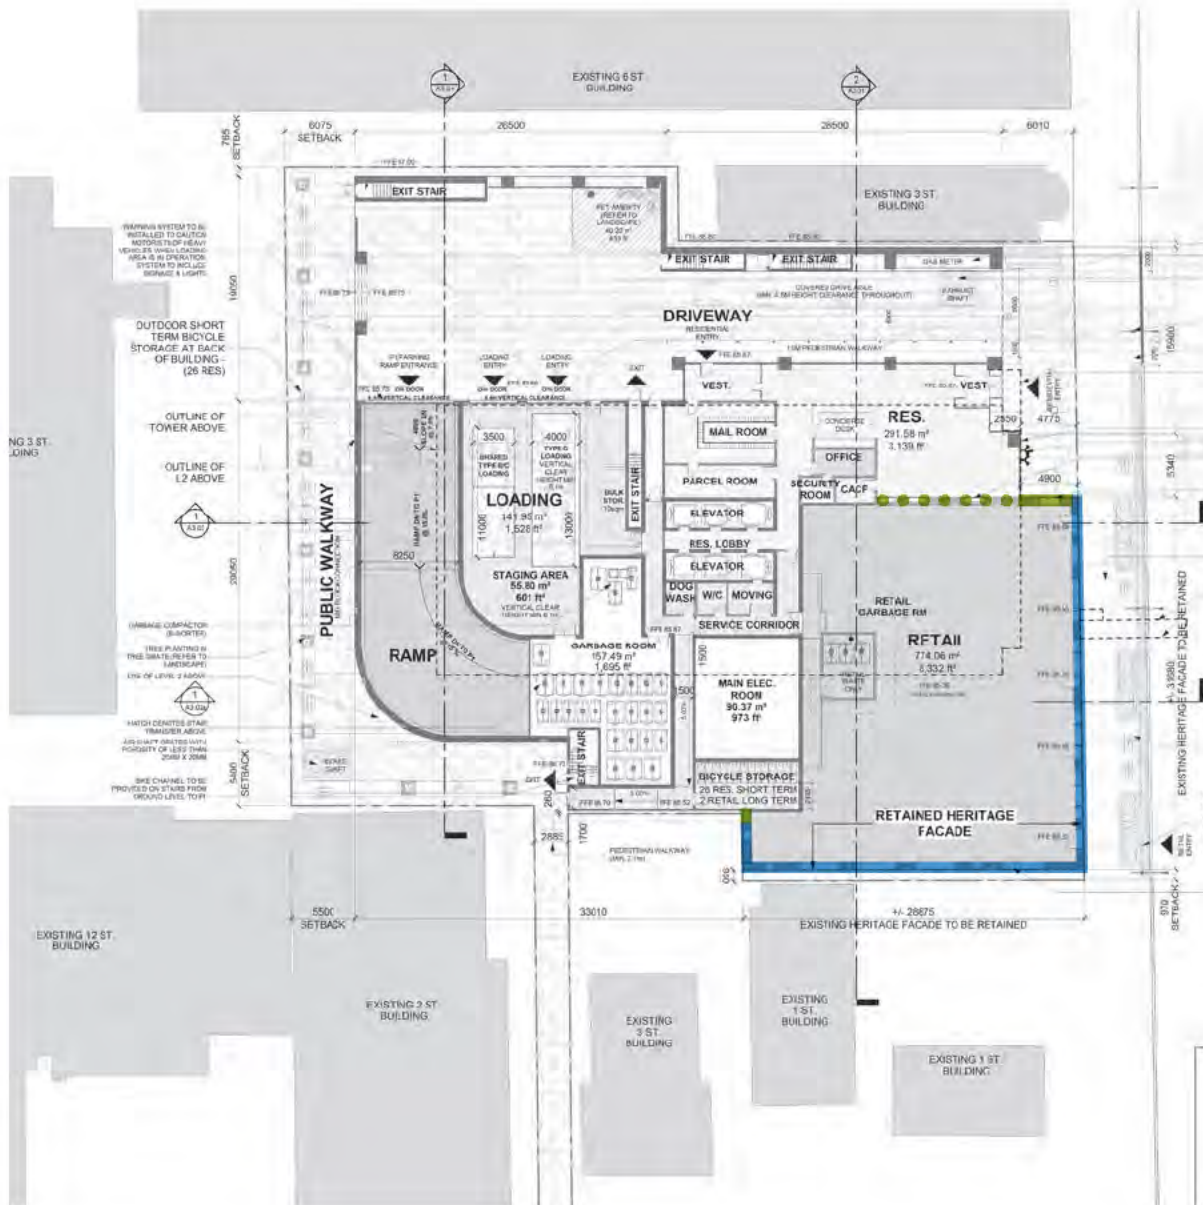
Proposed ground floor and site plan with retained and reconstructed facades highlighted (Wallman Architects, 2024; annotated by ERA).
